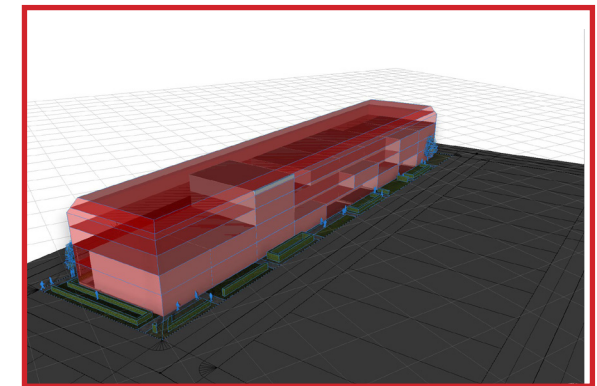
The building floors are setback randomly so that there are some overhanging floors.
